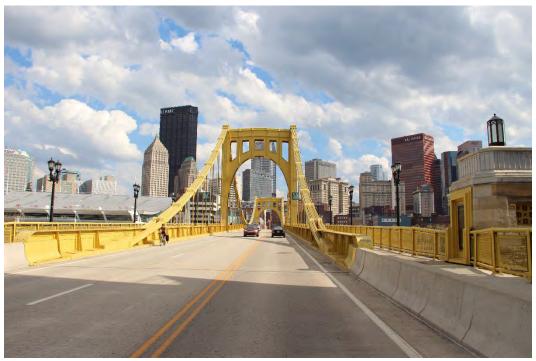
Rachel Carson Bridge (April 2024), overview of north end of bridge, facing south.
